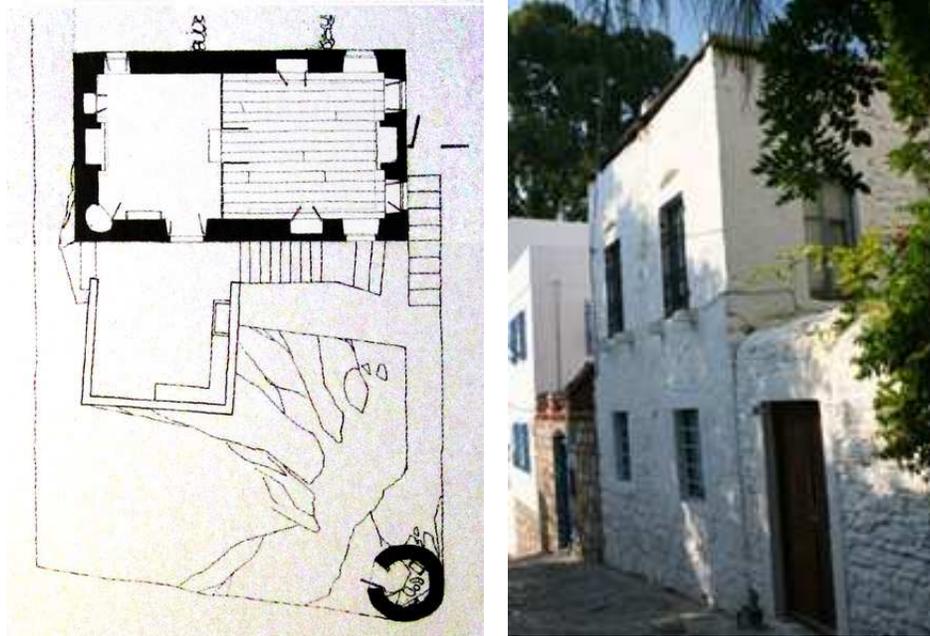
Schematic site plan (left) (Aran, 2000, p. 132) and a sample Bodrum dwelling (right) (Photograph by author)
